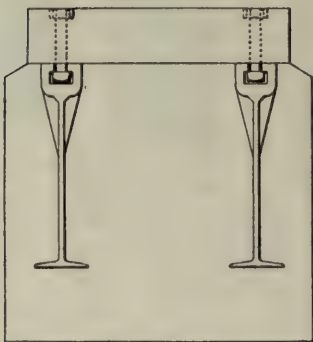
Compensator Foundation; Iron Piers Set in Concrete.
